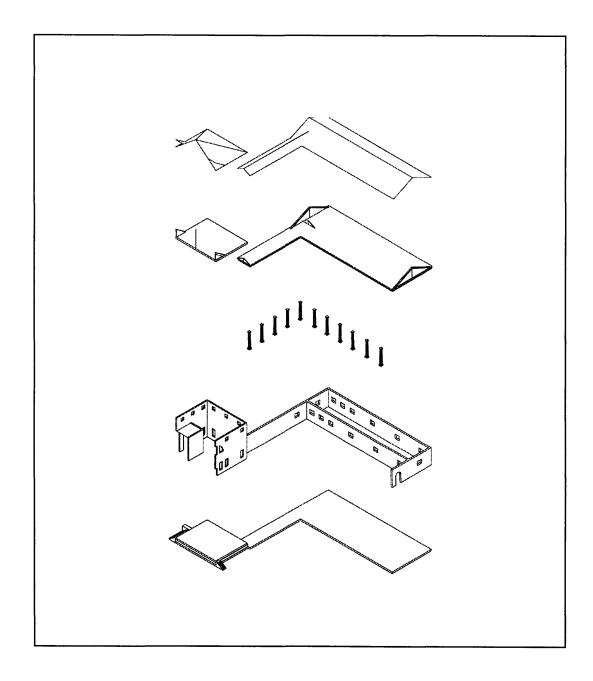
Five layers of the villa model, roof, cornice, columns, walls and base
